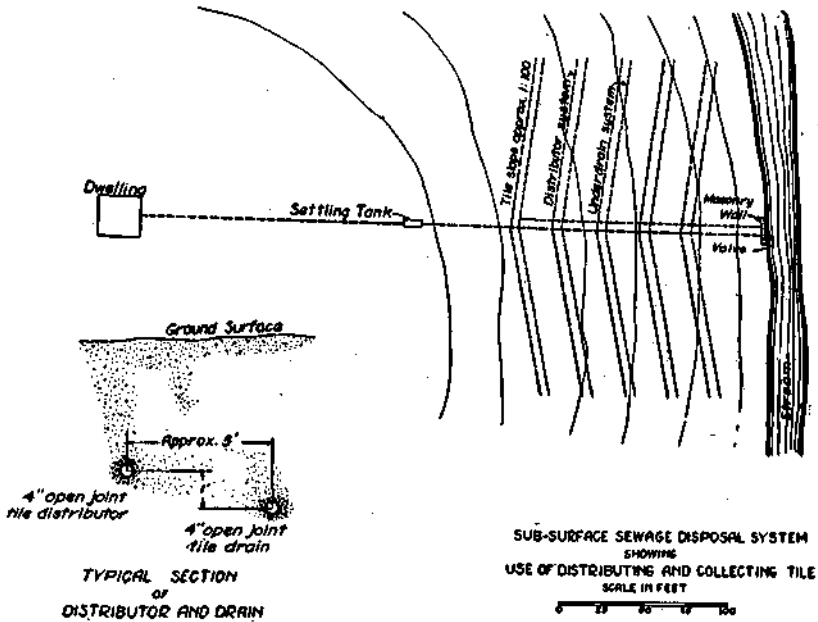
Subsurface sewage-disposal system showing use of distributing and collecting tile.
